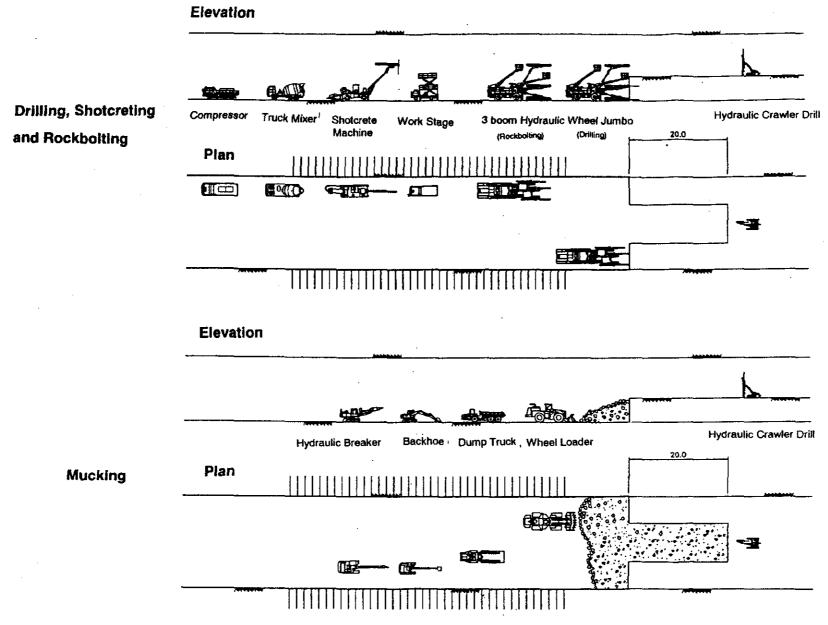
Cavern Excavation Method (Settling Bashine and Powerhouse)
